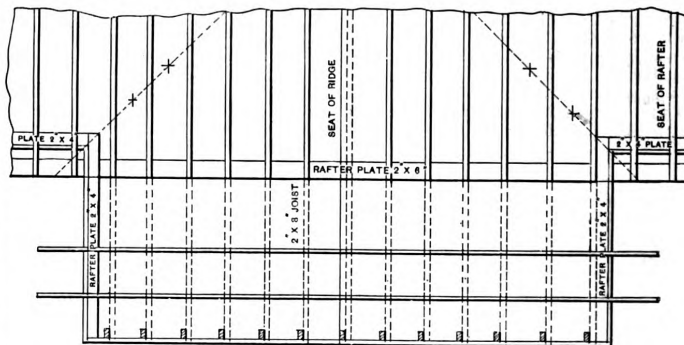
Plan of Roof, Showing Plates, Ceiling-Joists and Seat of Rafters.—Scale, 3-16 Inch to the Foot.
